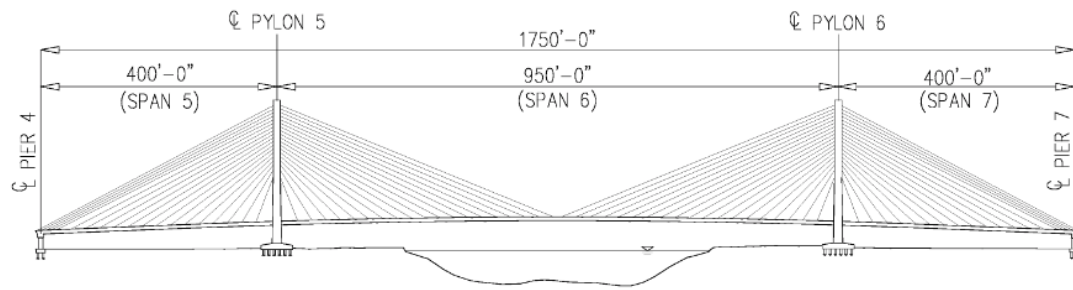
Elevation View of the Indian River Inlet Bridge (Marquez, 2013)
